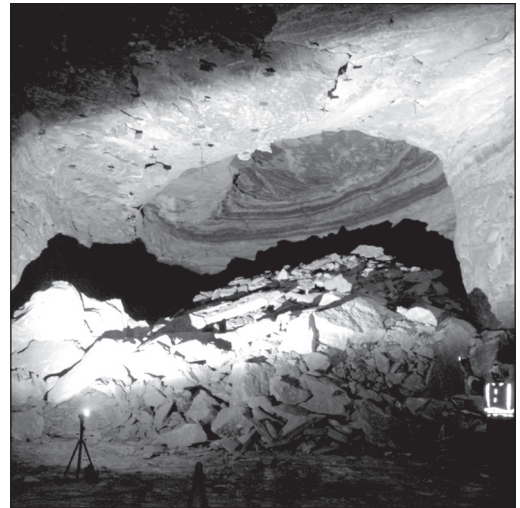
Example of large elliptical shaped roof fall that was related to high horizontal stress in the roof
